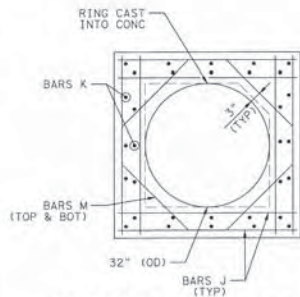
OPTIONAL CONCRETE PIPE RISER
